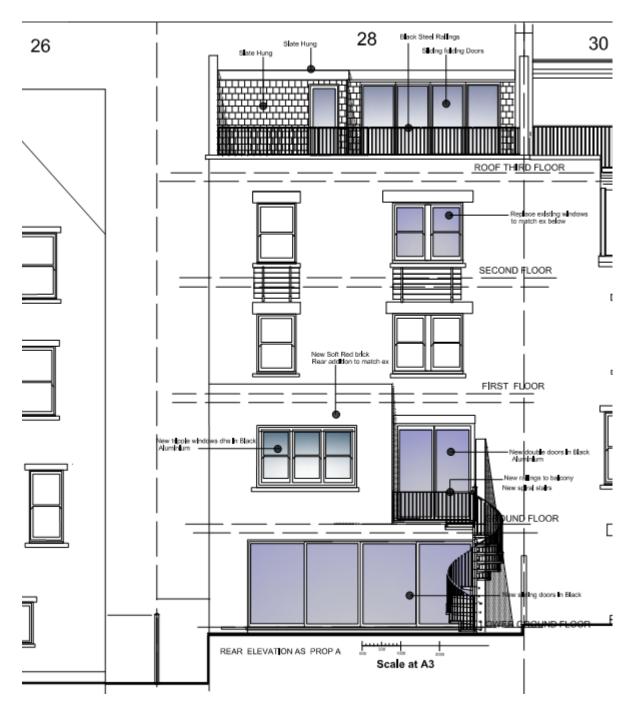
(above): Proposed rear elevation (source: Application proposed drawings)
